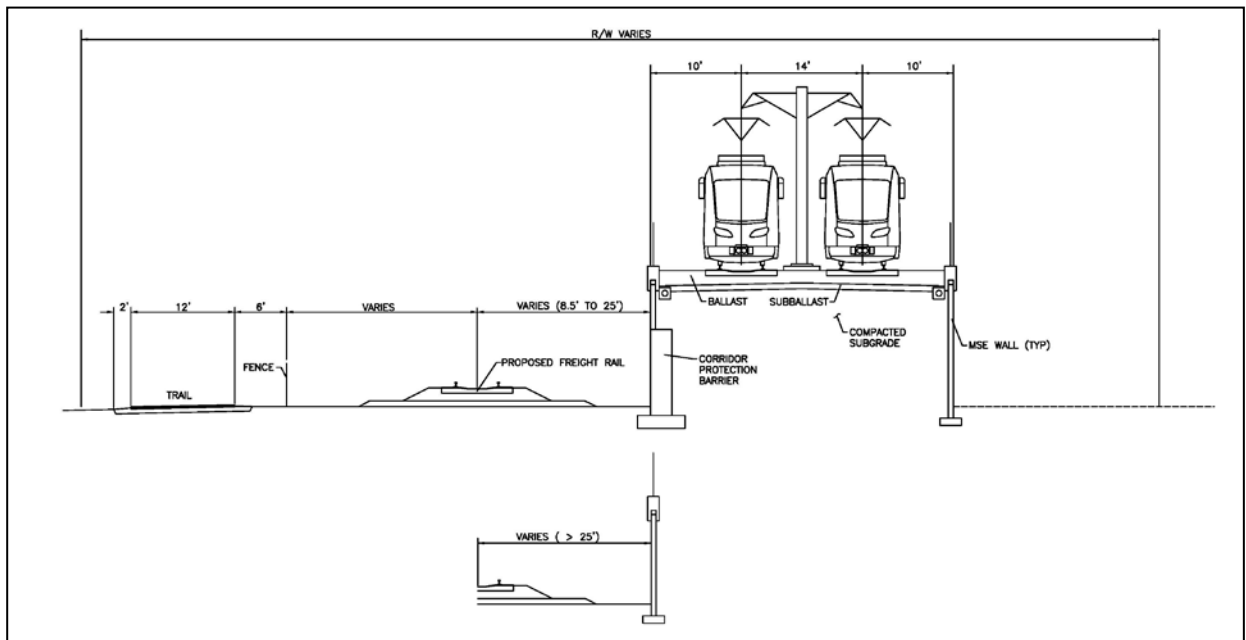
LRT Guideway – LRT 3A-1 (Co-location Alternative)
